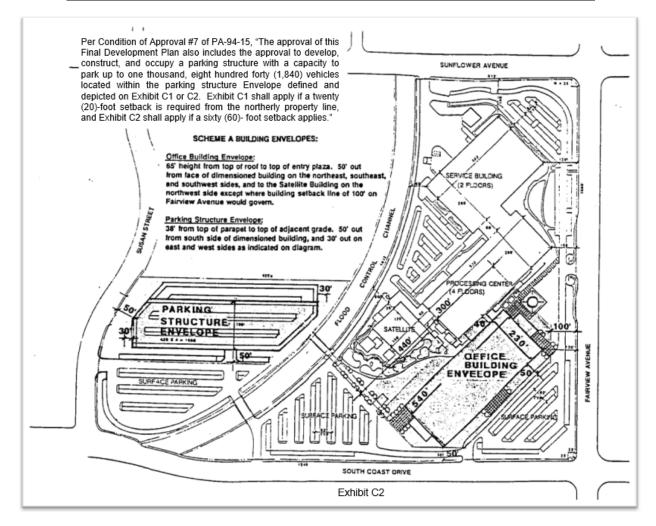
Illustration of the 60-Foot North Parking Structure Setback
